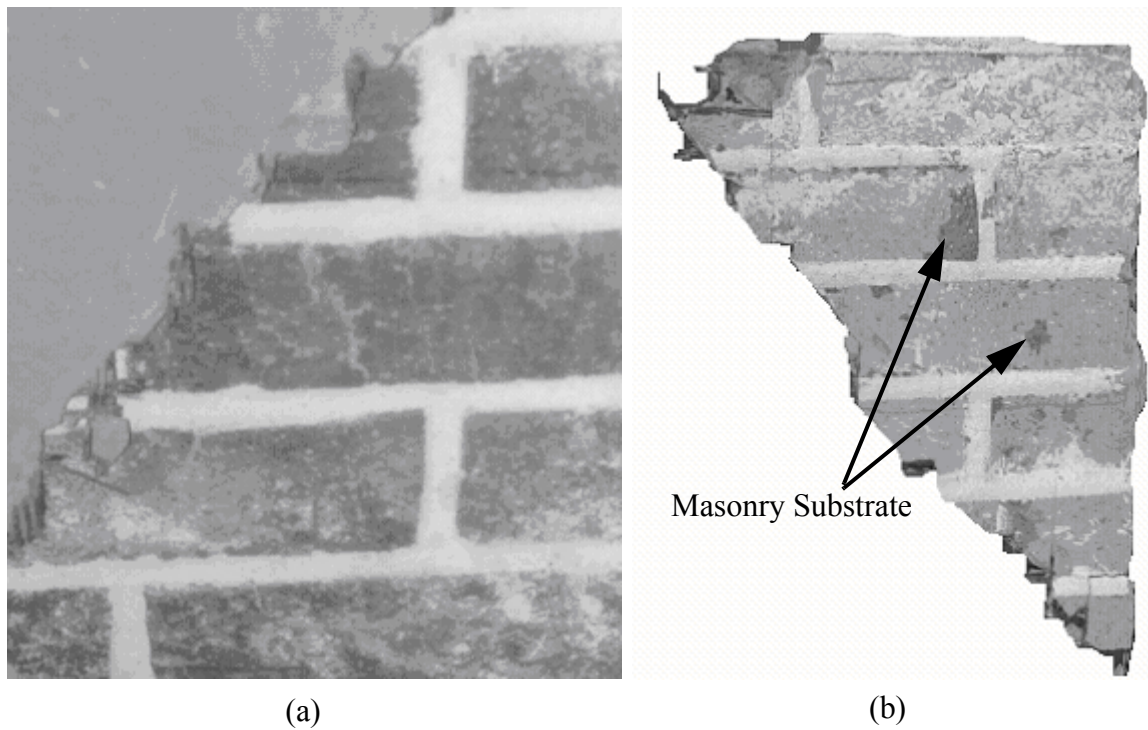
Photograph of (a) the masonry wall following the extraction of the external reinforcement and (b) the back of the extracted external reinforcement.
